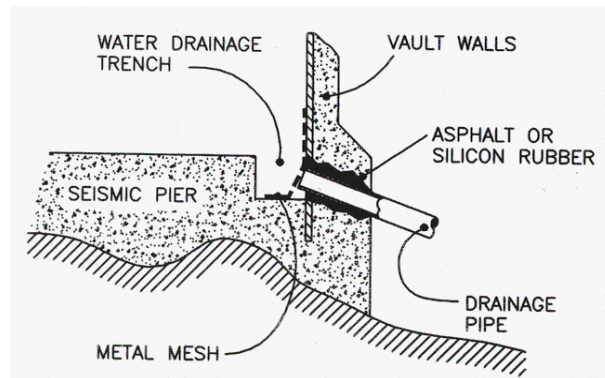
Water drainage pipe and vault trench around the seismic pier.
